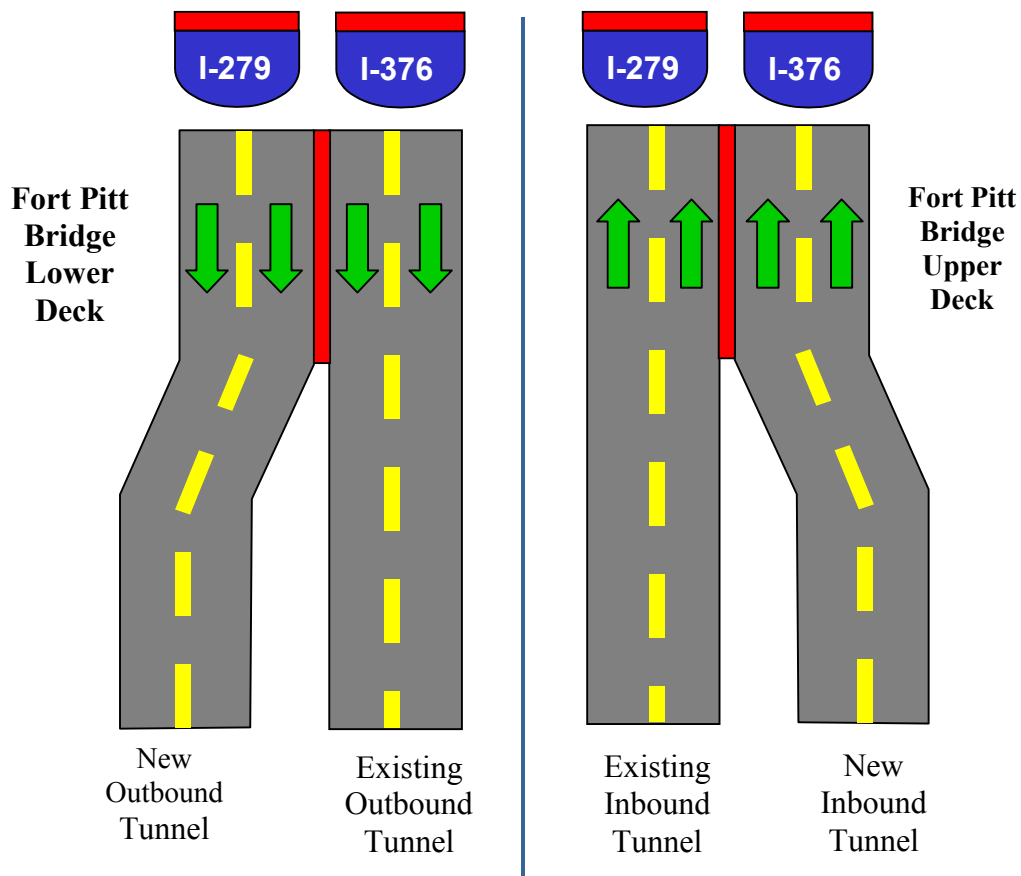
Plan View of North End of Fort Pitt Tunnels - Inbound
